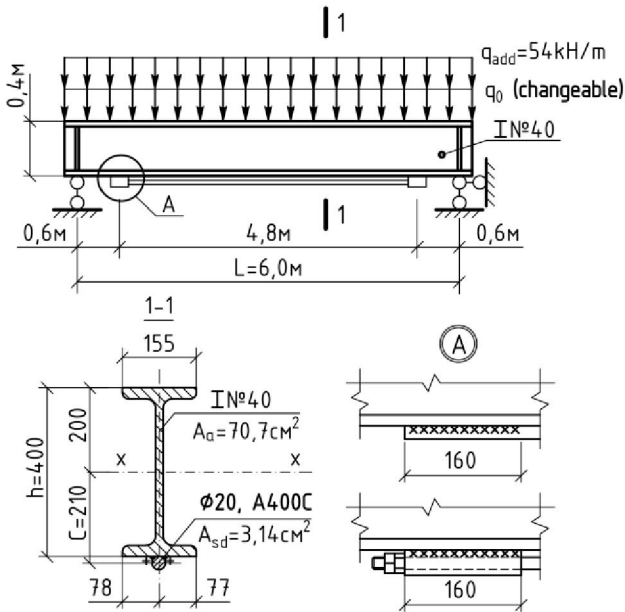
Calculation scheme of the steel beam made of I-beam № 40, with a span $L = 6$ m, which is strengthened under partial loading. (q_0 , kN/m.) by installing horizontal elements made of reinforcing bars or rolled steel strips of length $l_{sd} = 4.8$ m in the tensile zone, which are fixed to its bottom flange using support elements or arc welding.
